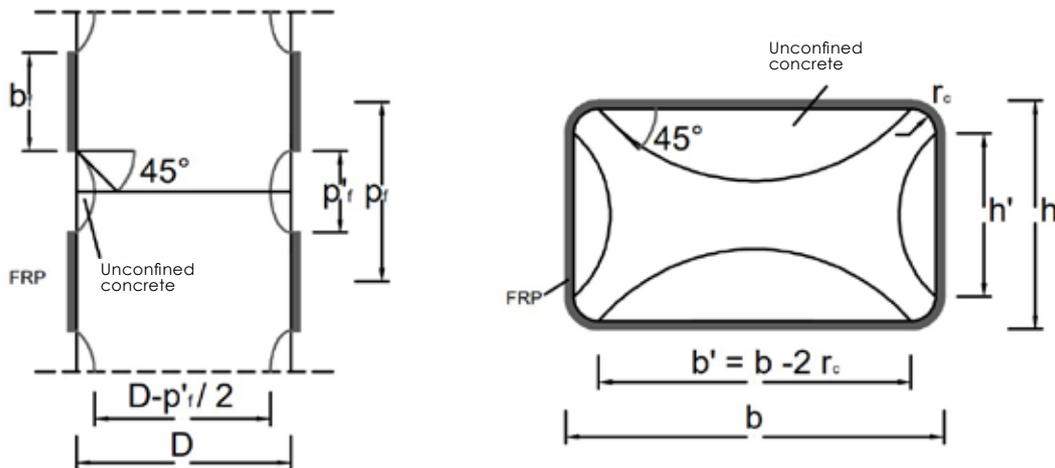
Confinement intervention on a reinforced concrete section using FRP reinforcements
